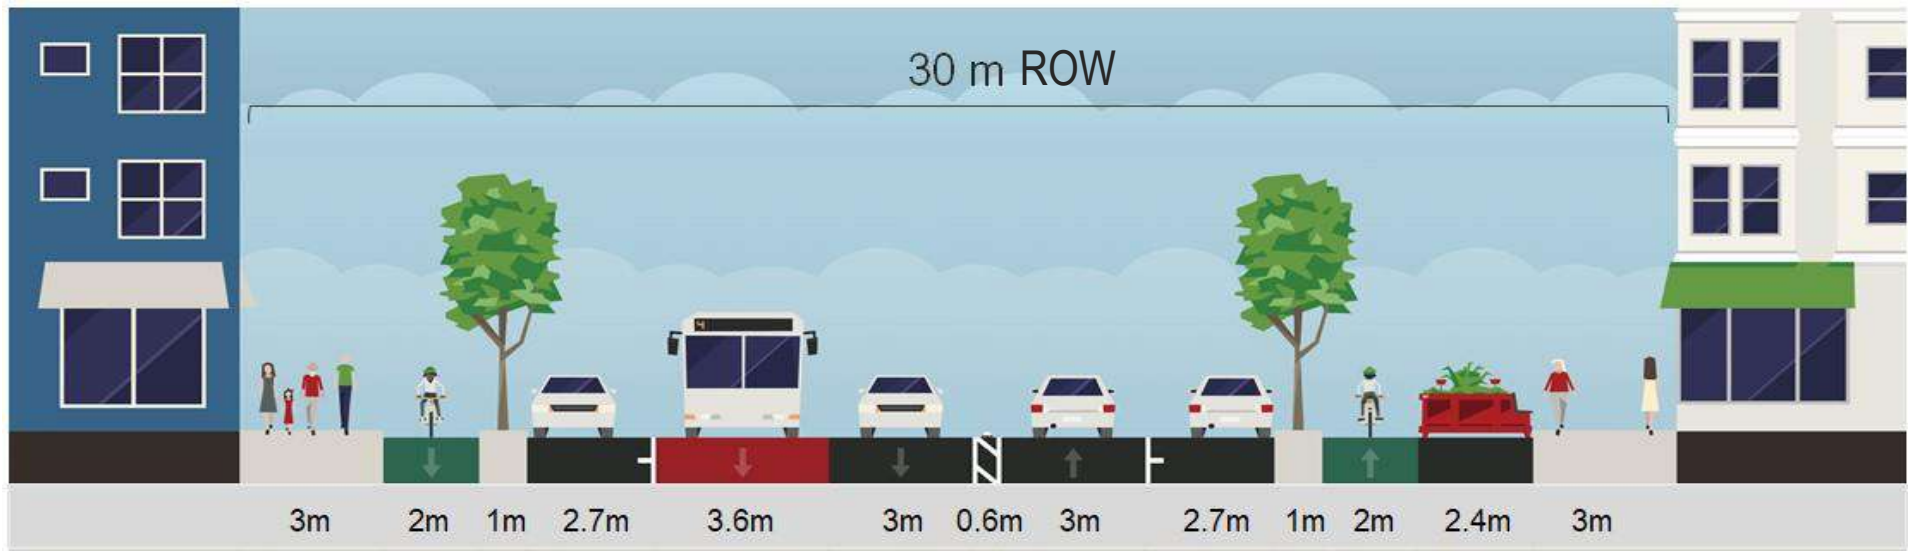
Concept 2 central street cross-section (SURP, 2019)
